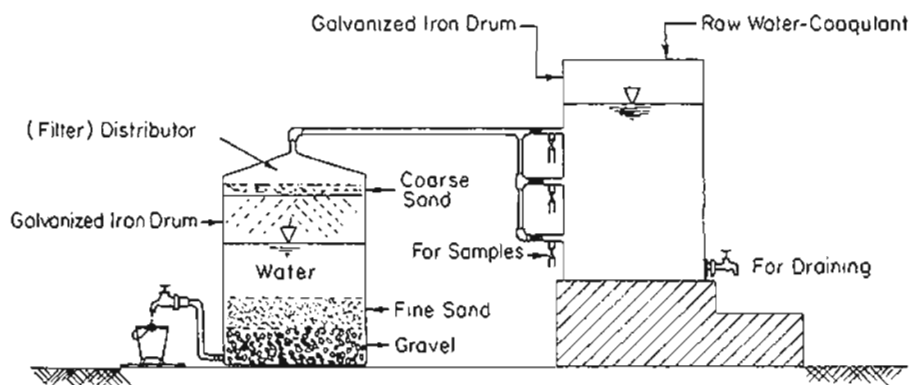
Construction Proposal for a Small-Scale Village Plant Utilizing Water Coagulation and Sand Filtration
